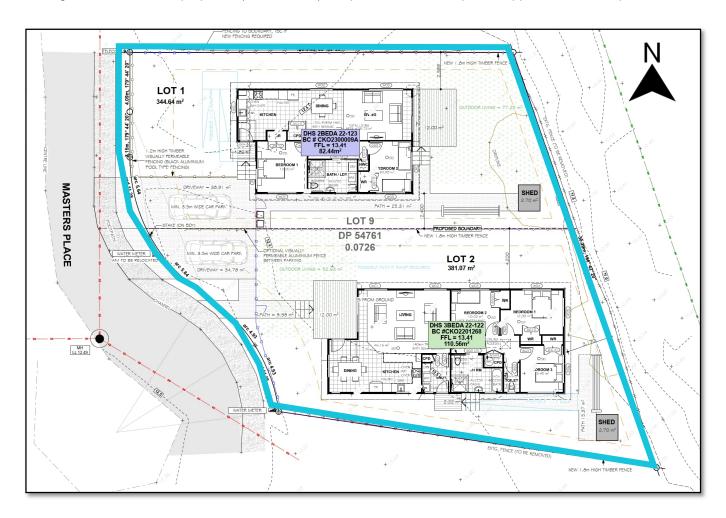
Proposed site plan, cyan colour represents the whole site boundary. Source: CTM Architectural Ltd.
